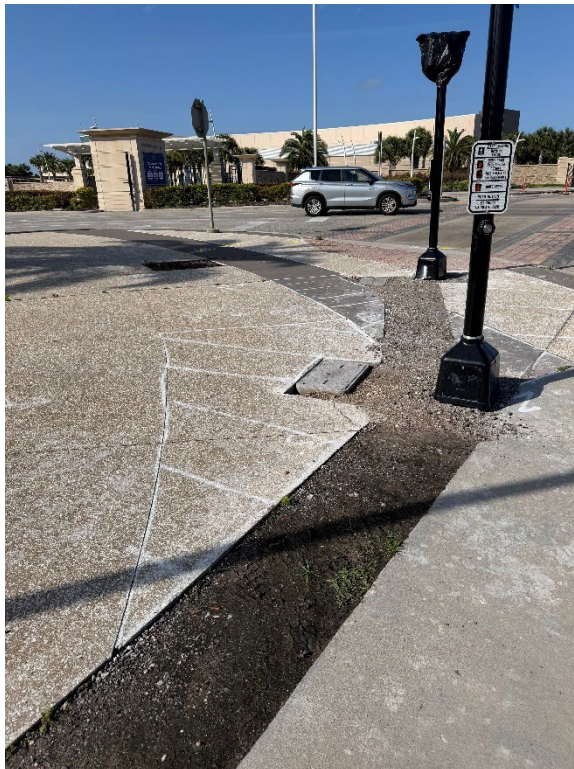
Surficial Concrete Cracks in Handicap Ramp (No Observed Changes)
